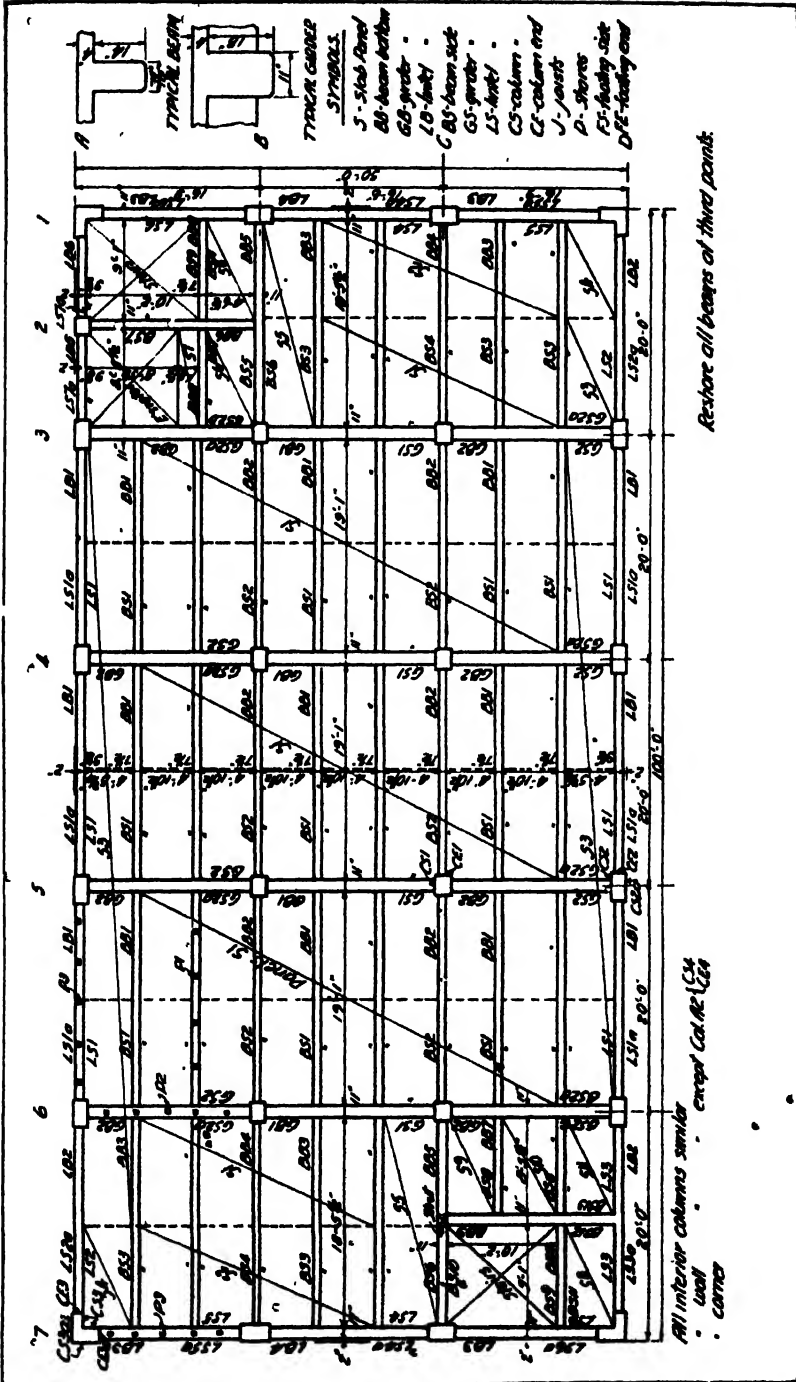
KEY PLAN TO PANELS FOR 5-STORY BUILDING.
